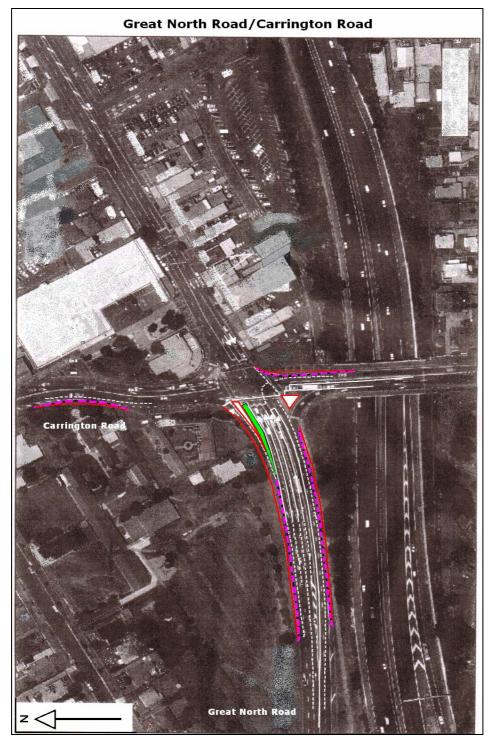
Feasibility plan of the Great North Road/Carrington Road intersection (not to scale).
